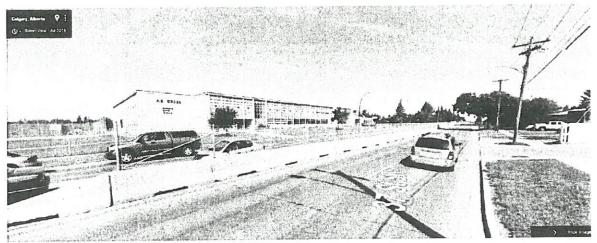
Raised Concrete Barrier and Fence on 37th Street in Calgary
